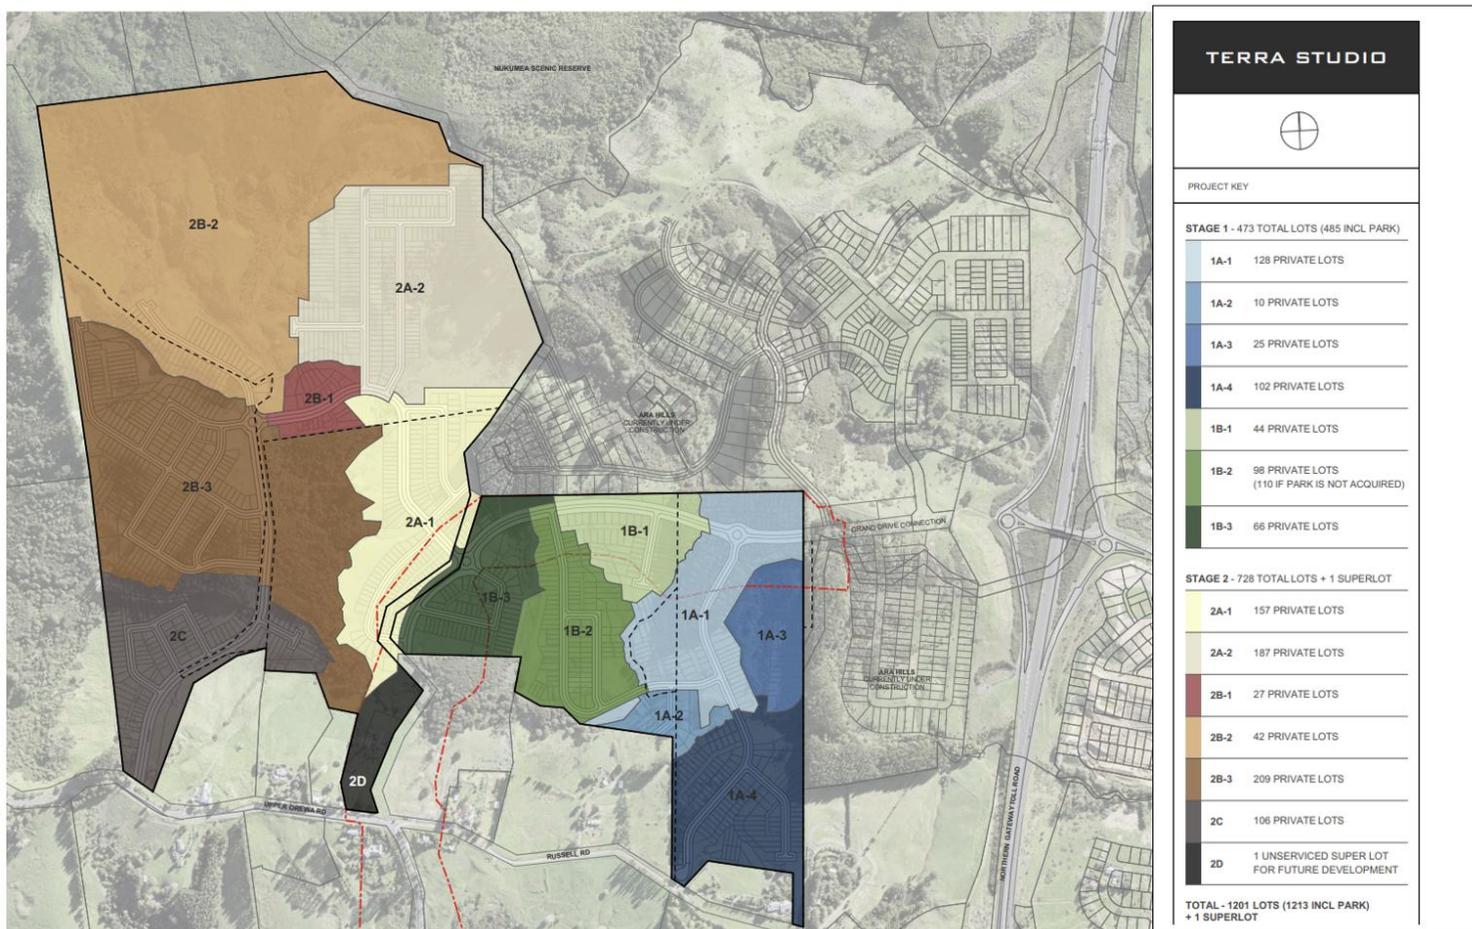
Staging Plan of the proposed development (source: Terra Studios)
